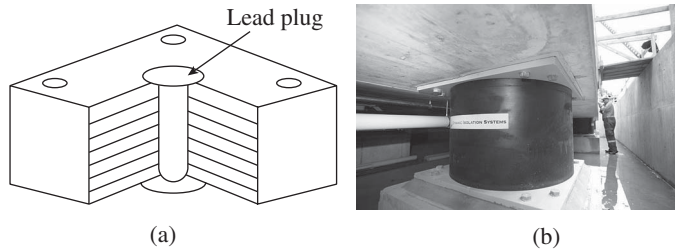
Seismic base isolators (a) Laminated rubber bearing pad (b) External view
